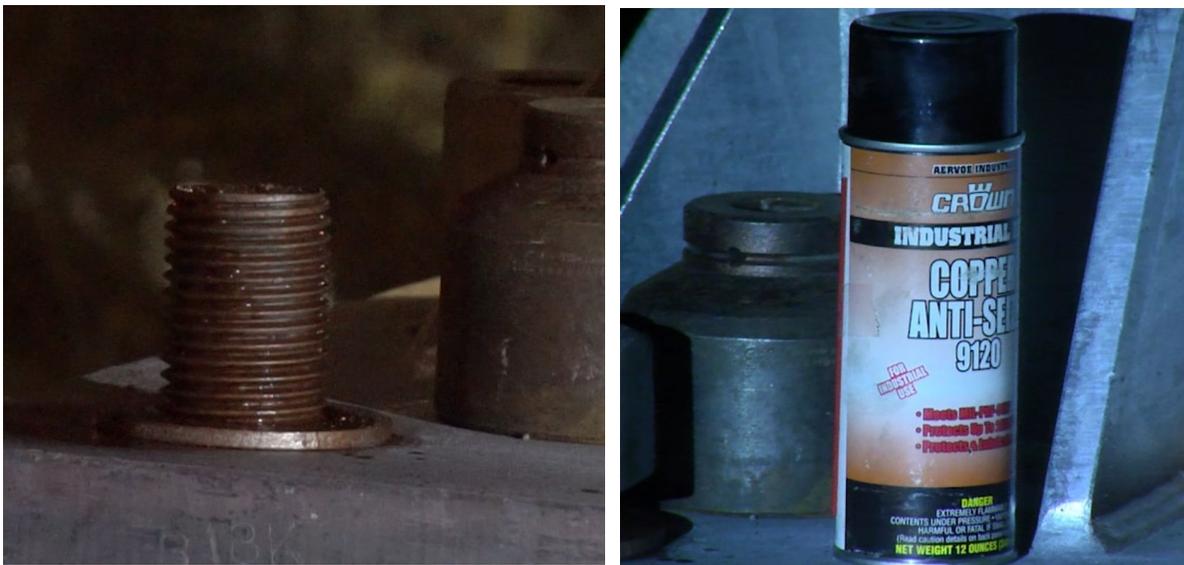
Lubricated anchor rod connection (left) and lubricant utilized (right)
